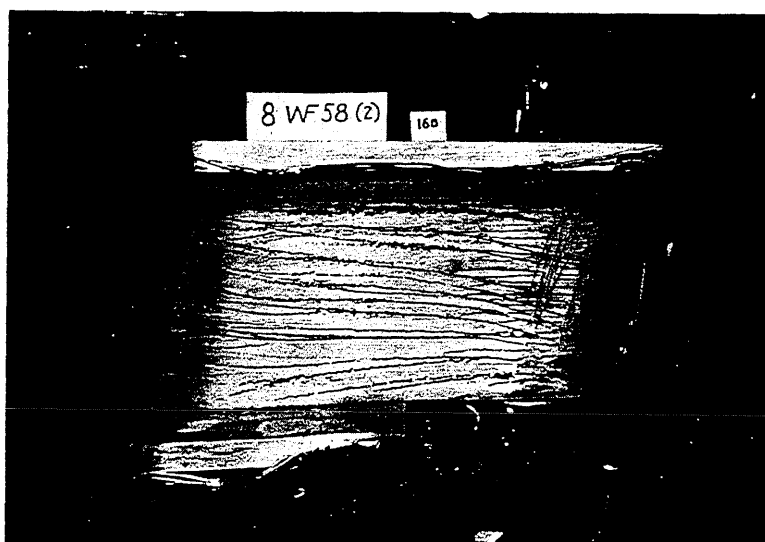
BEAM B2a - V-M SECTION - LOAD = 160 KIPS
